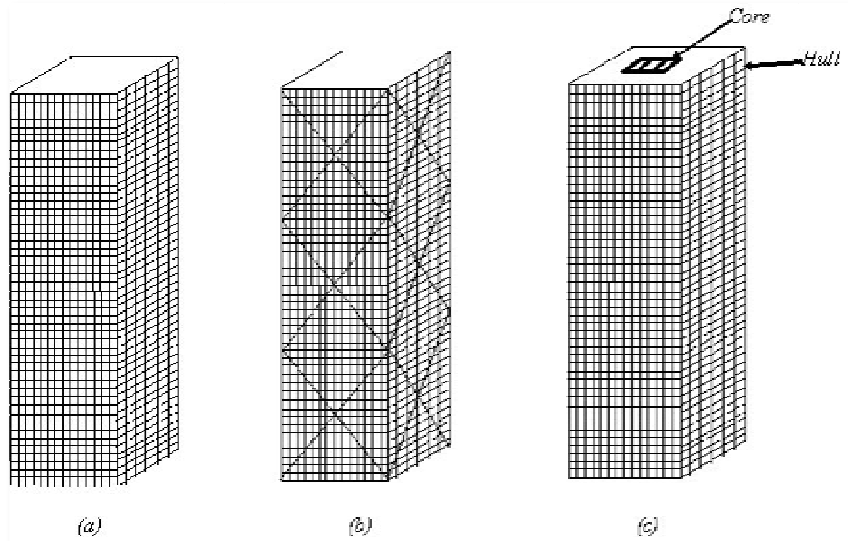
(A) FRAMED TUBE (B) BRACED FRAME TUBE (C) TUBE-IN-TUBE-FRAME
